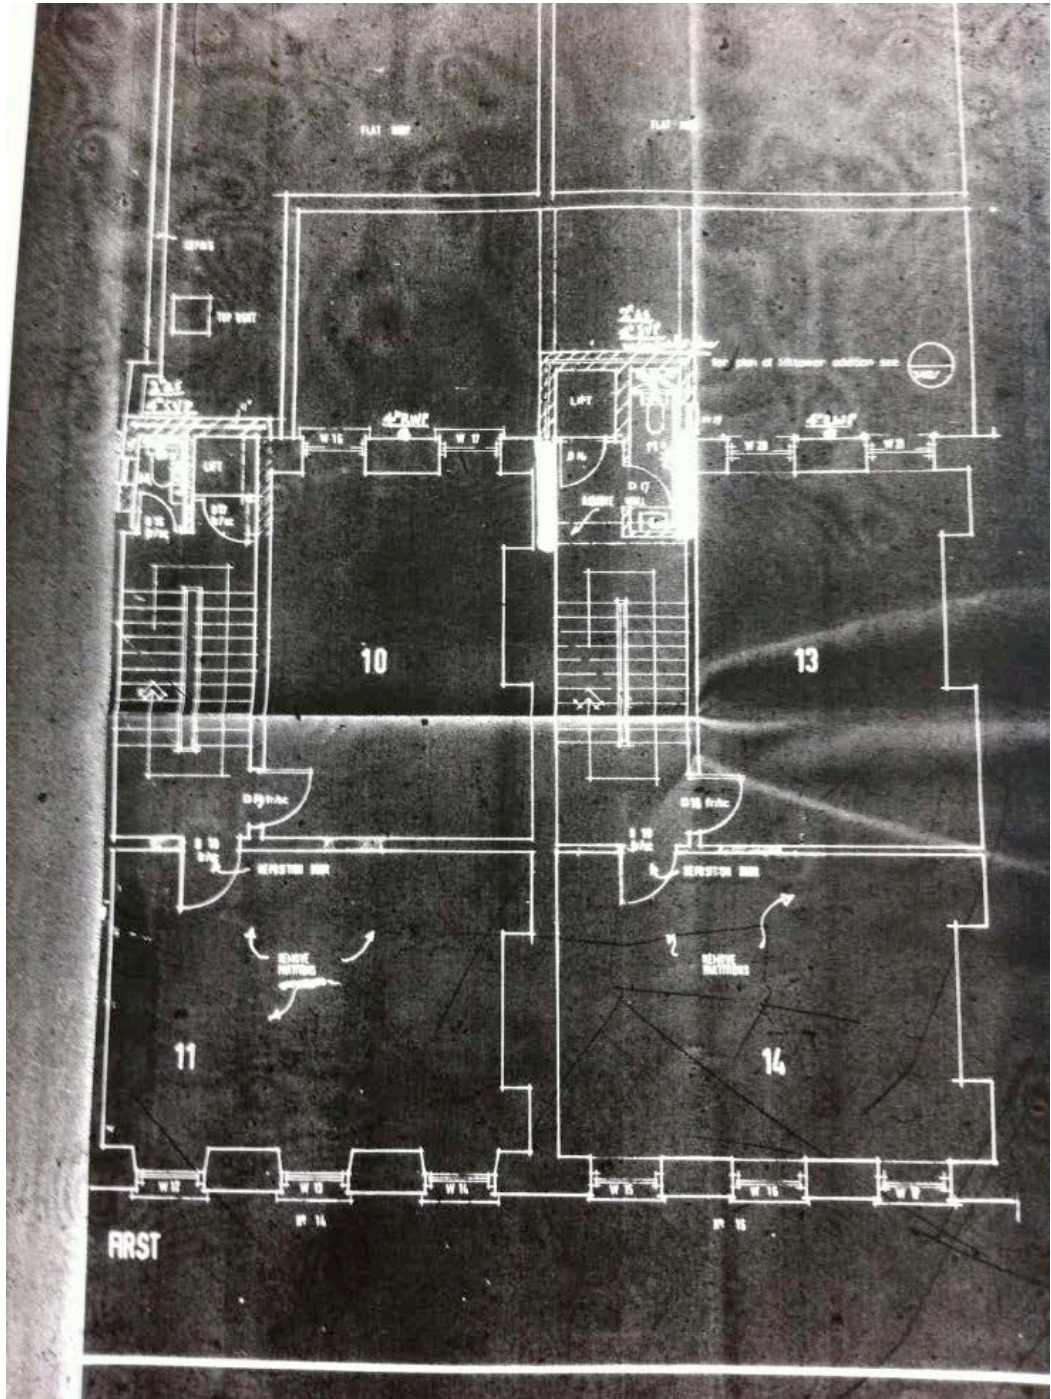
b: First floors plans, 1972 for 14 and 15 Southampton Place
